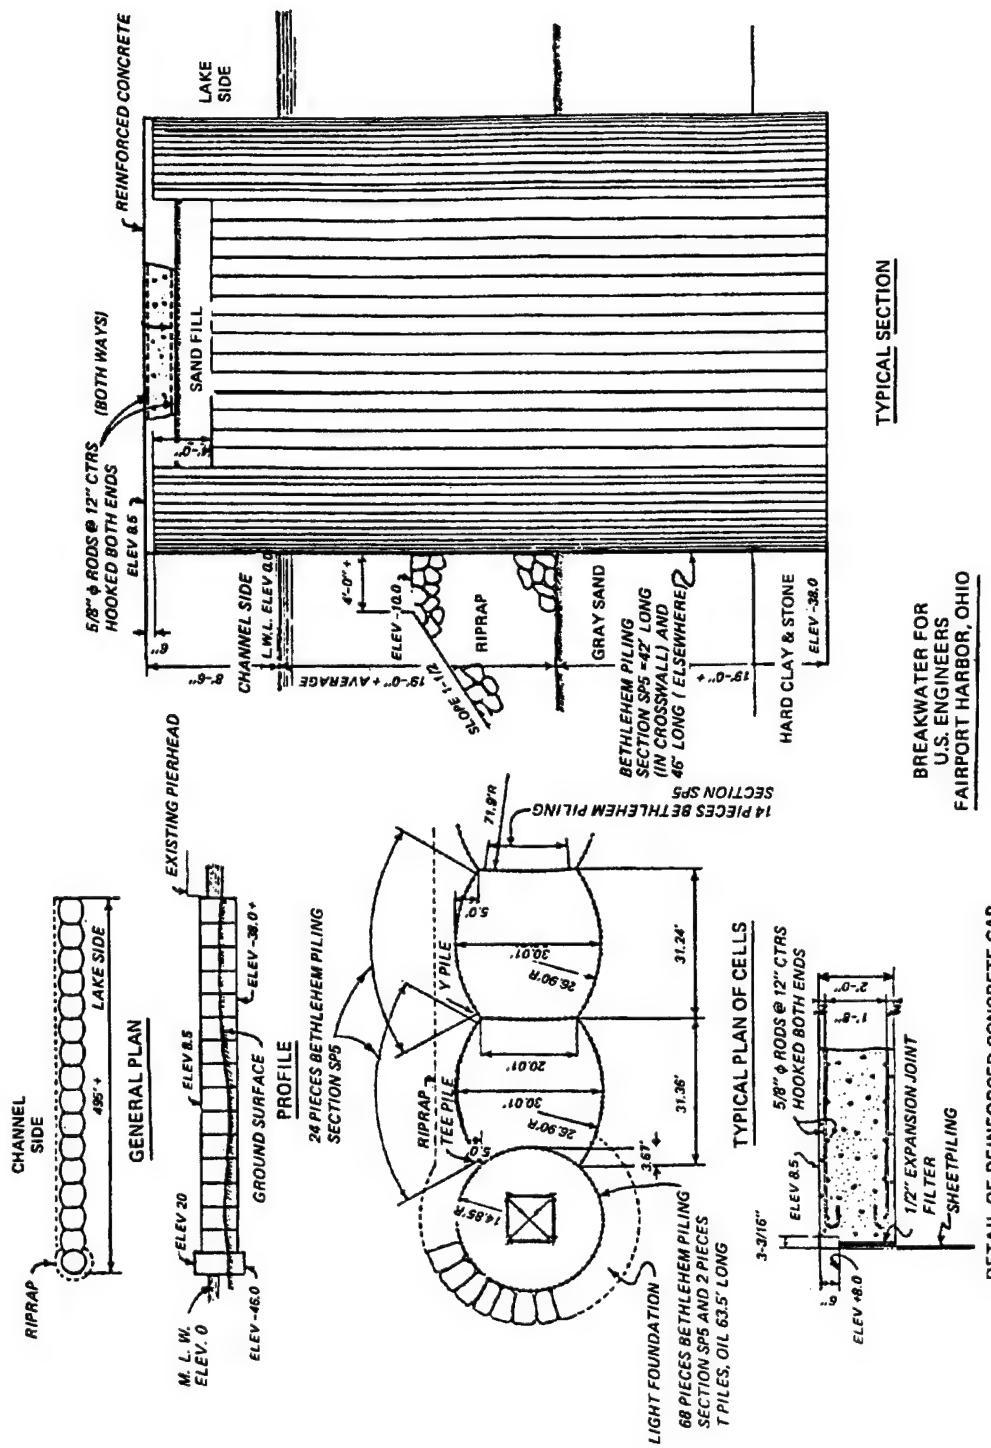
Steel sheet pile breakwater constructed at Fairport Harbor, Ohio
